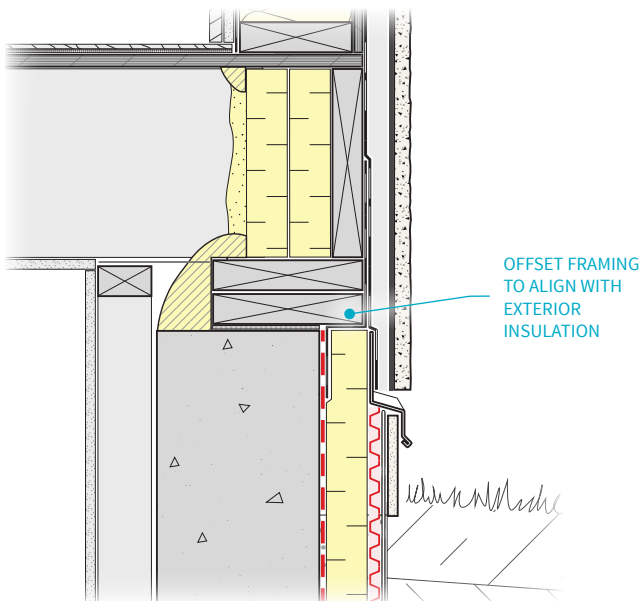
Conventional above-grade walls could be offset over exterior-insulated below-grade walls to align the drainage and finish surfaces.
